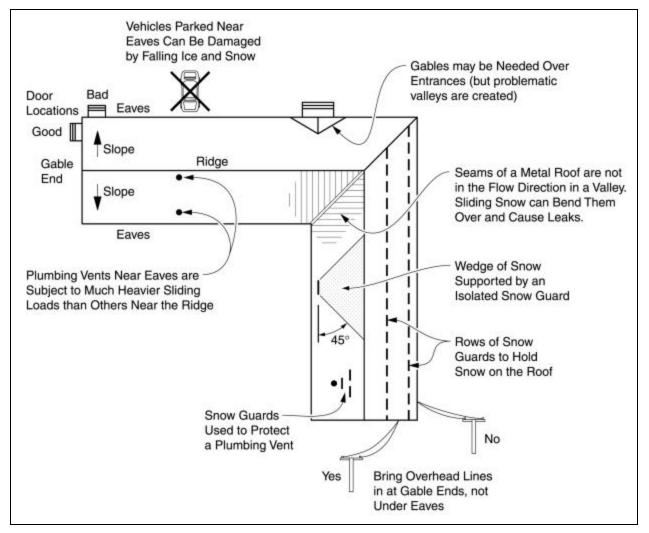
Plan view of a gabled-roof building showing some sliding snow issues.
